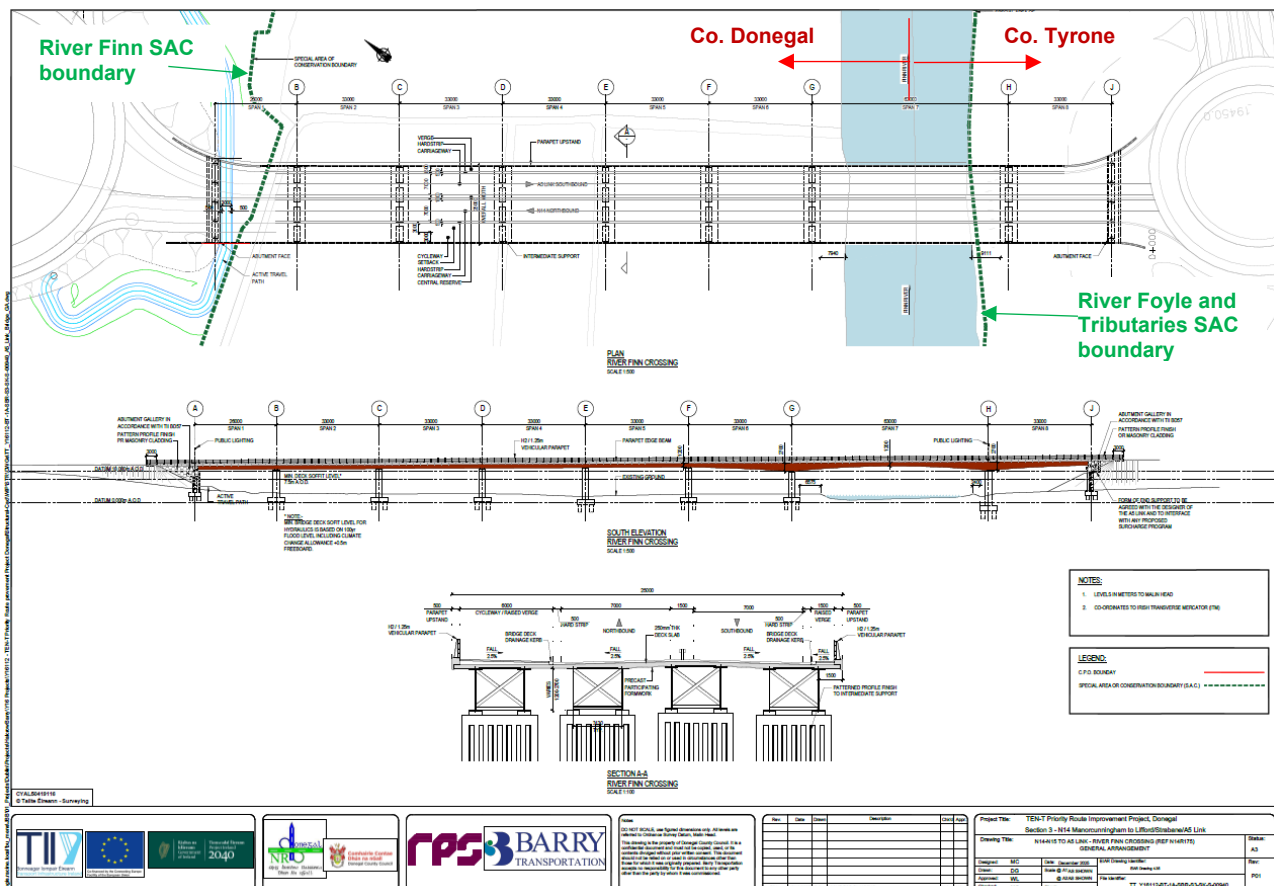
B-4: N14/N15 to A5 Link - River Finn Crossing General Arrangement
